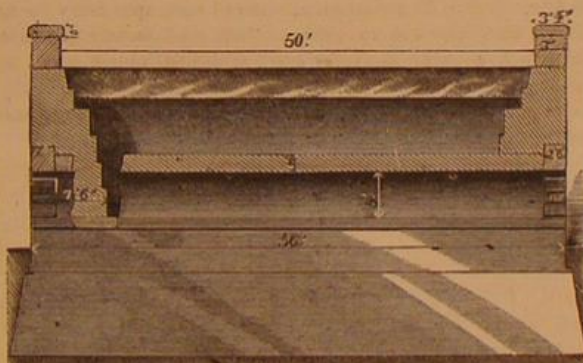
THE UNDERGROUND RAILWAY, NEW YORK CITY.—END ELEVATION OF THE VIADUCT.
